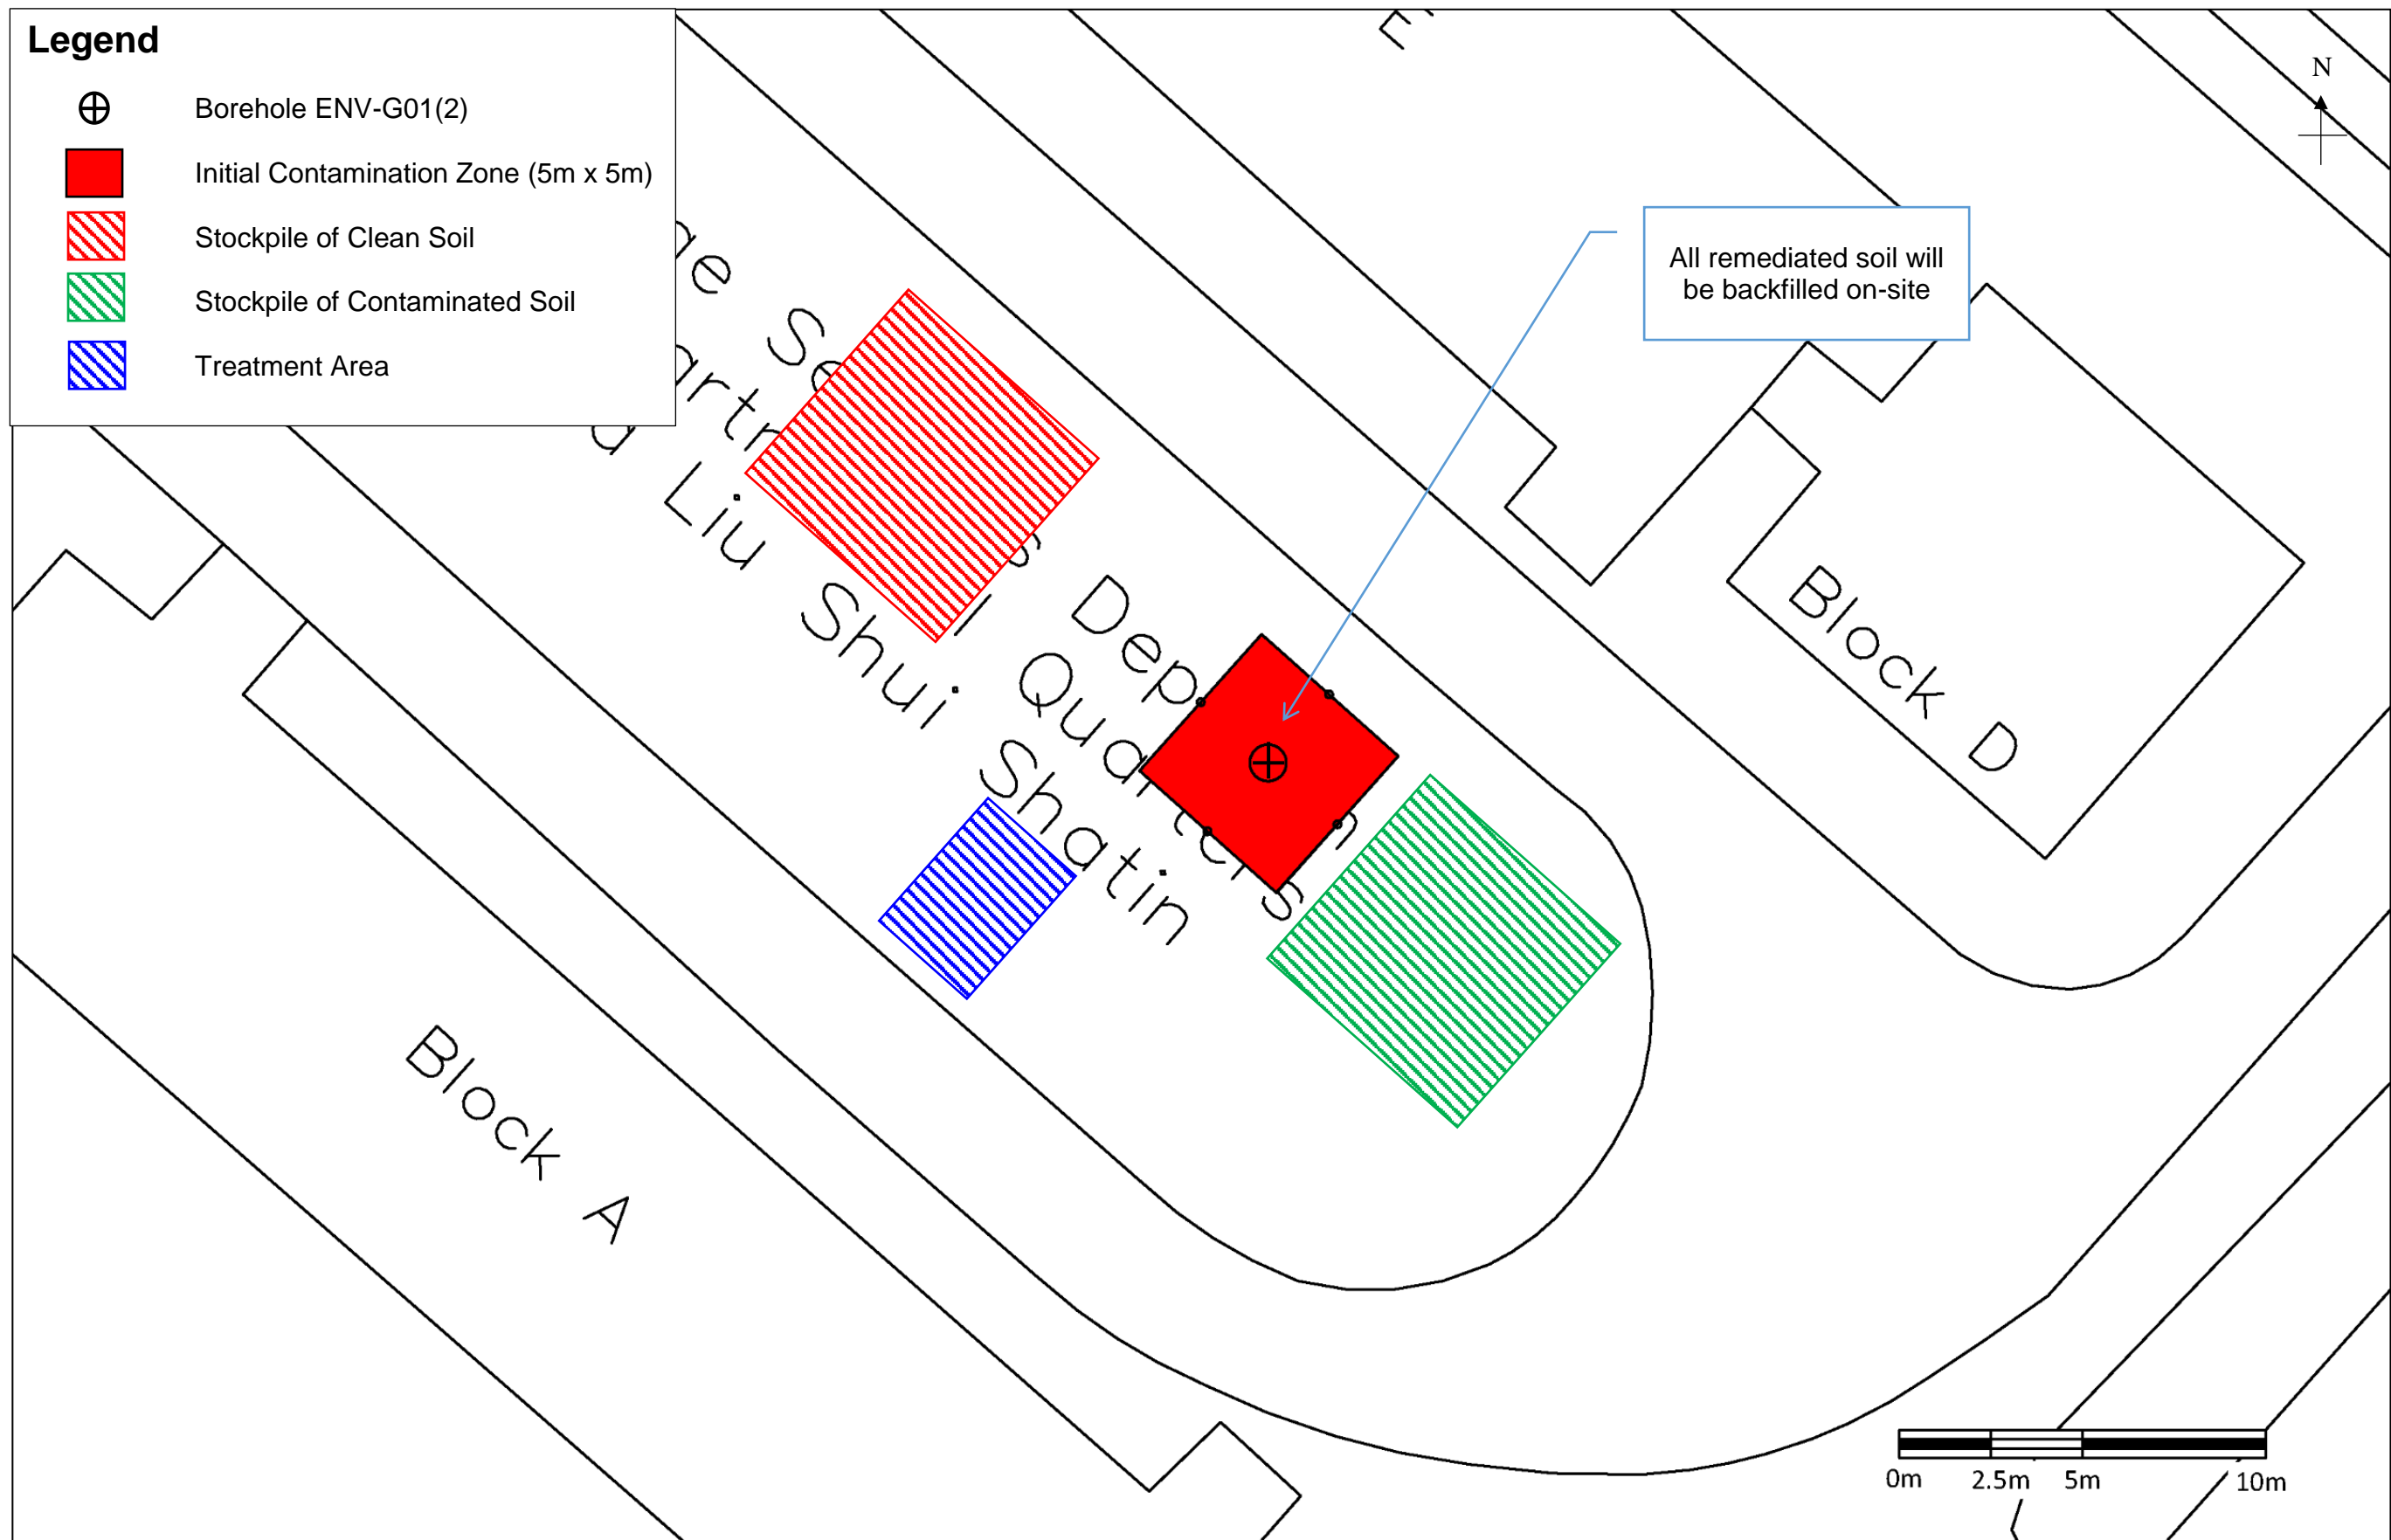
Tentative Stockpiles and Treatment Area Layout Plan
